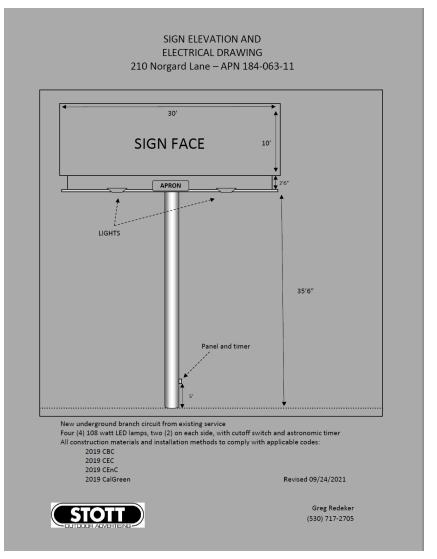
Elevation and lighting drawing (Provided by Applicant)
